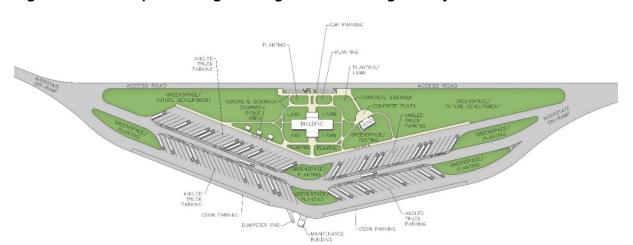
Concept Drawing for Large Truck Parking Facility with Interstate Access
